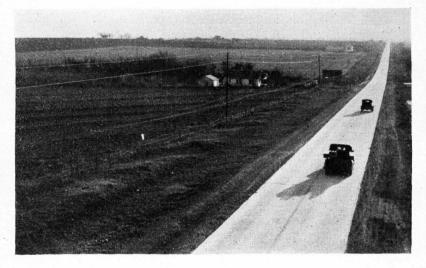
A cooperatively constructed and maintained terrace-outlet channel and highway-drainage ditch. If a satisfactory agreement can be arranged between the landowner and highway officials the same ditch may be used to carry the run-off from both the highway and the adjacent farm land.
